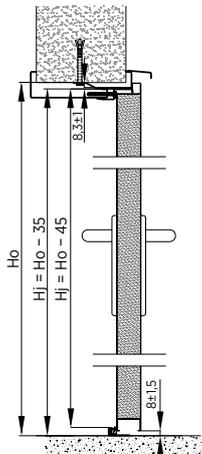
Installation of the single-leaf door with a wrap-around frame in a masonry wall, vertical cross-section
